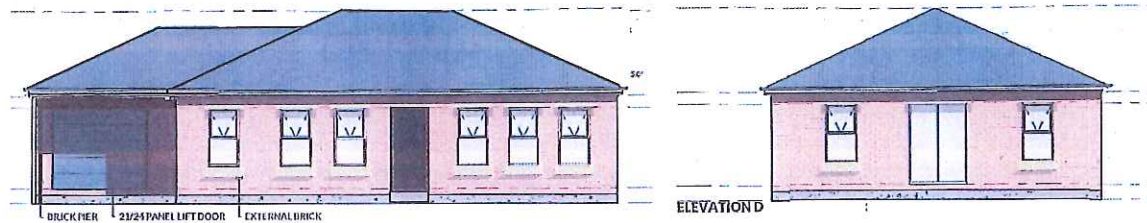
Elevations facing King Street (LHS) and Main Road (RHS) adjusted to reflect conditions.
